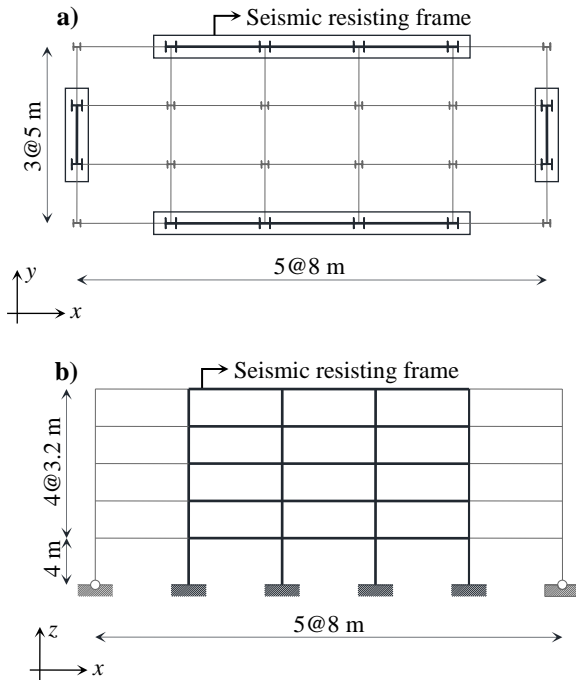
(a) Plan view; and (b) elevation view of the prototype building
